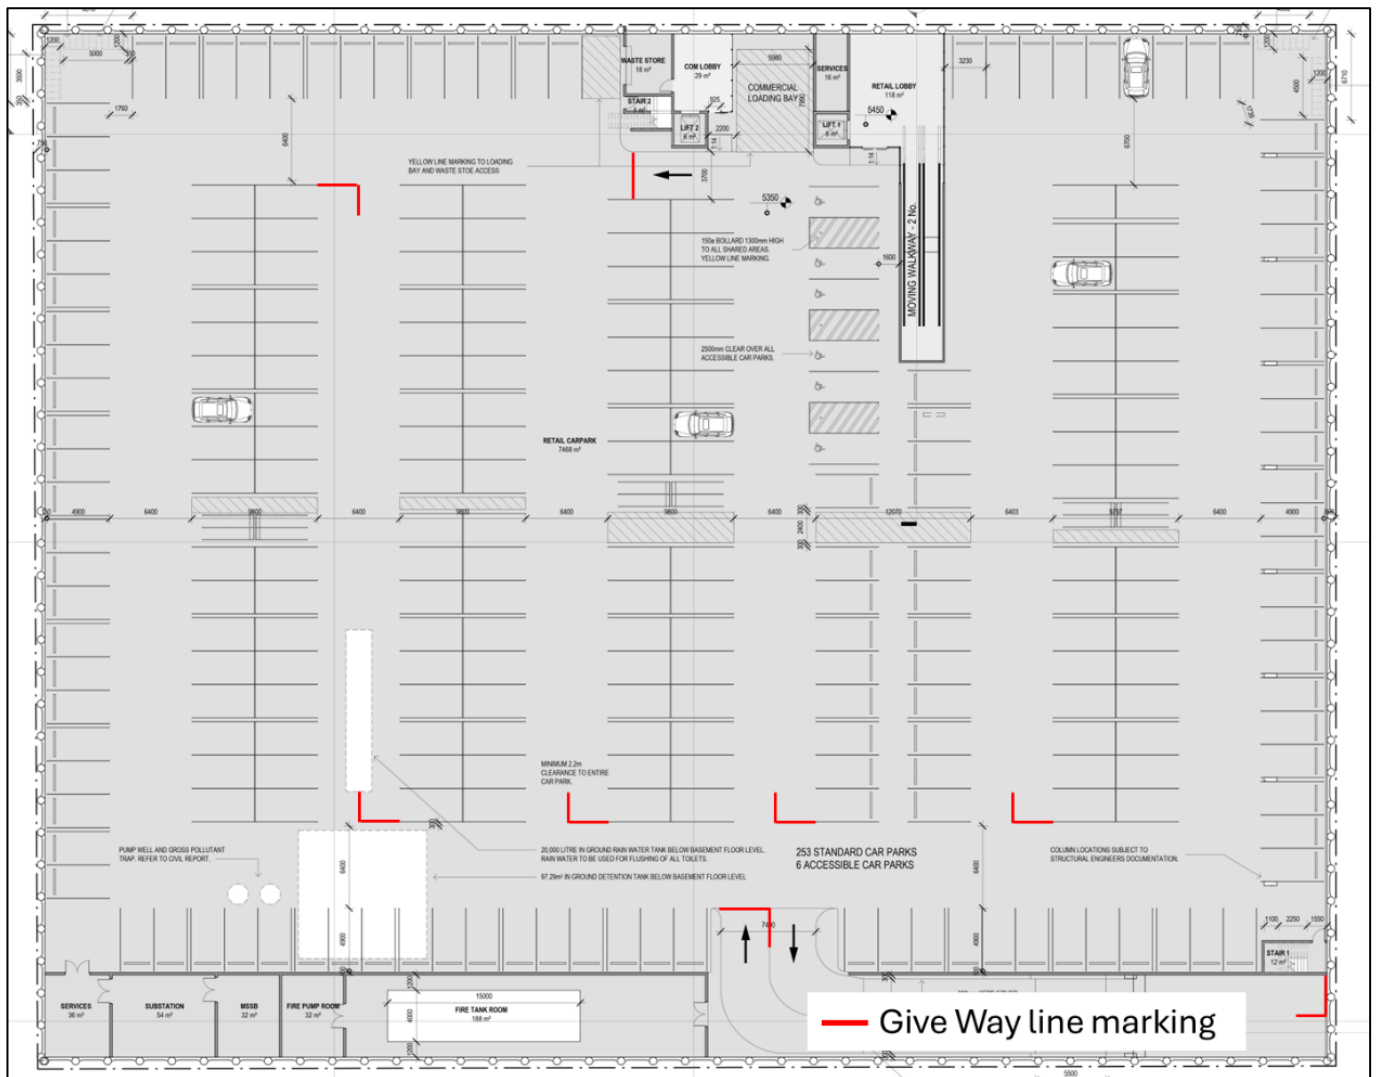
Proposed Basement Carpark Give-Way Linemarking
